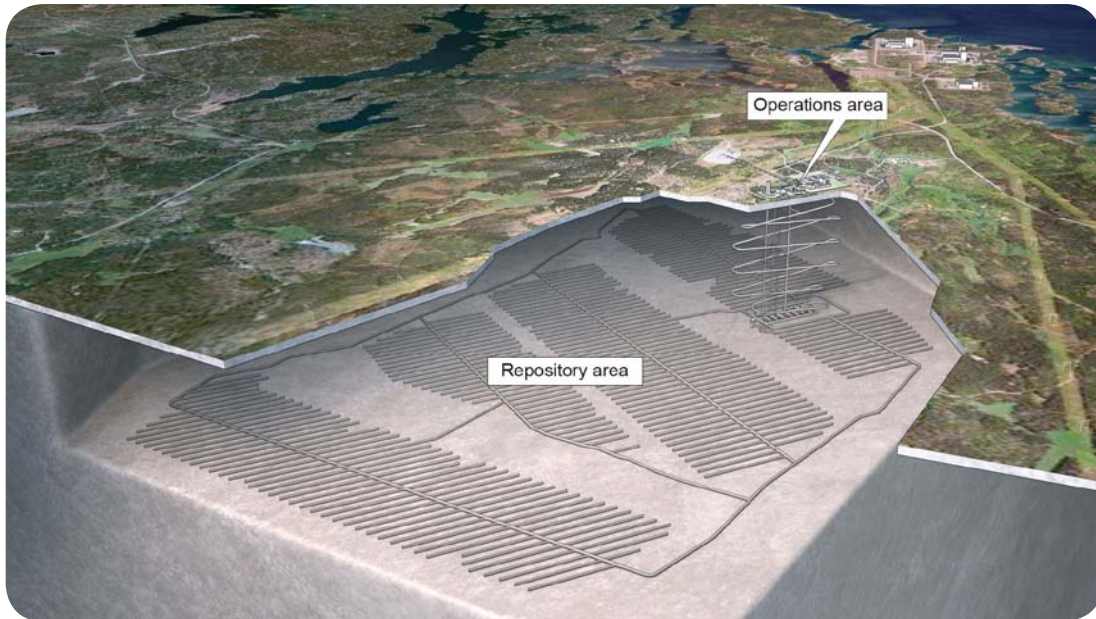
The underground part of the final repository in the studied siting at Laxemar.
